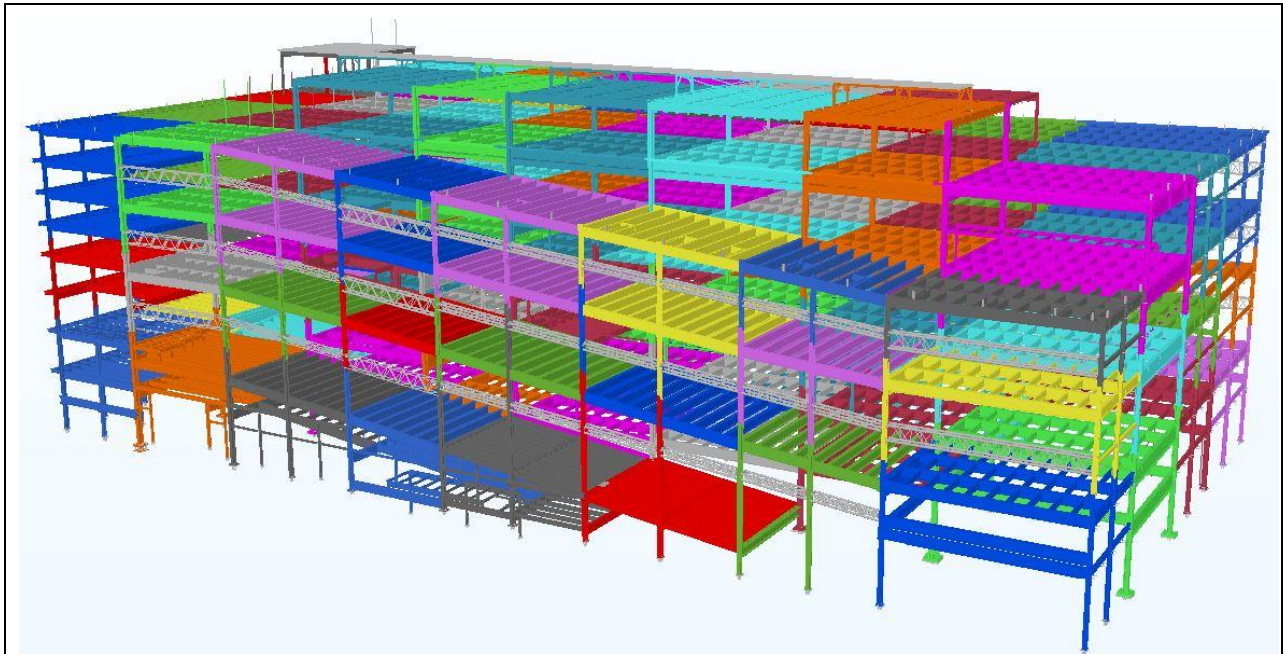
Structural steel model created by Owen Steel Company, Inc.
